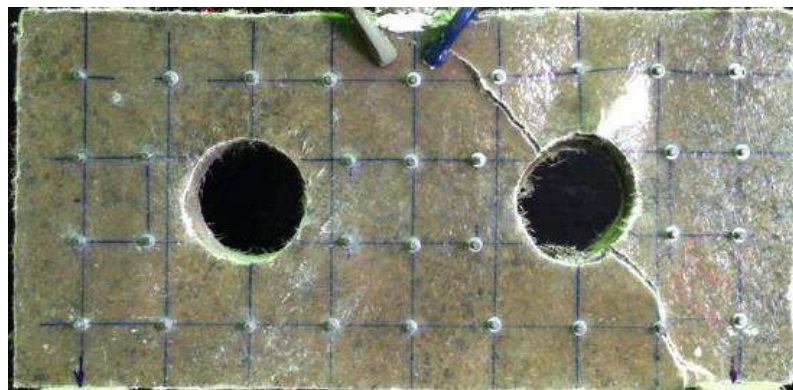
Typical failure mode of SFRP strengthened beam specimen of group C
